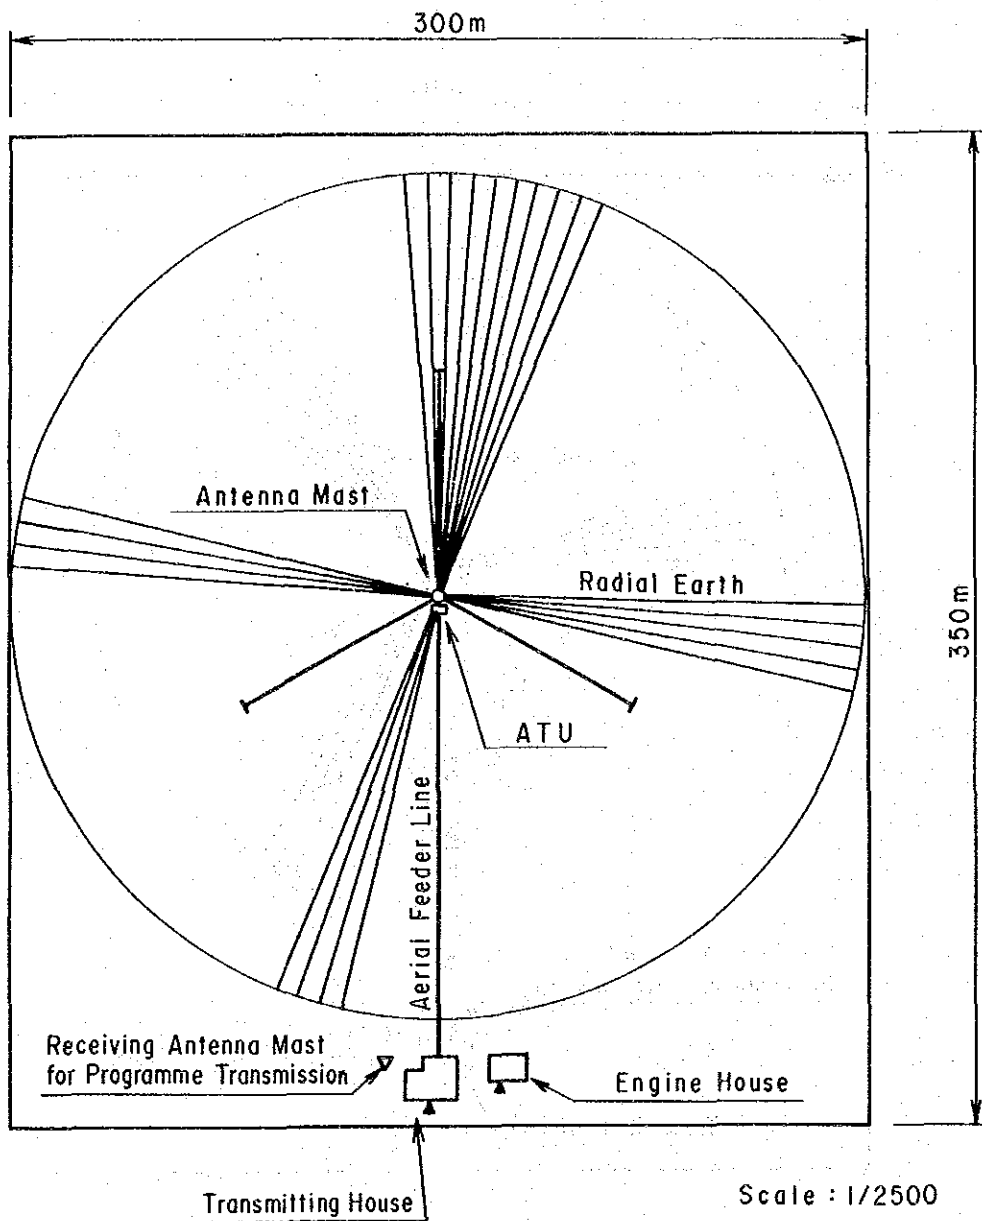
Fakfak Sorong Transmitting Station ; Site Plan (New Site)
